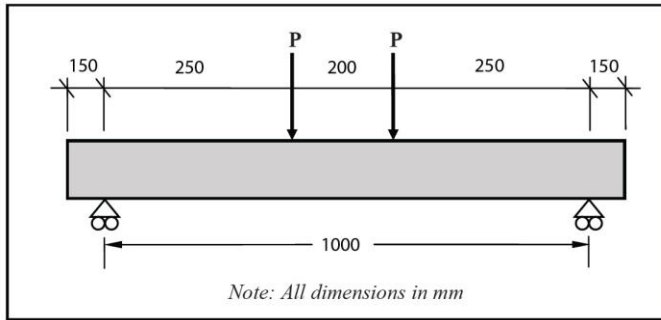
Schematic diagram of the reinforced concrete slab test setup
